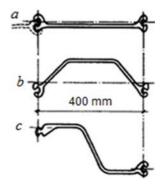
Profiles of a rolled steel sheet pile: *a* — flat; *b* — trough; *c* — Z-shaped
